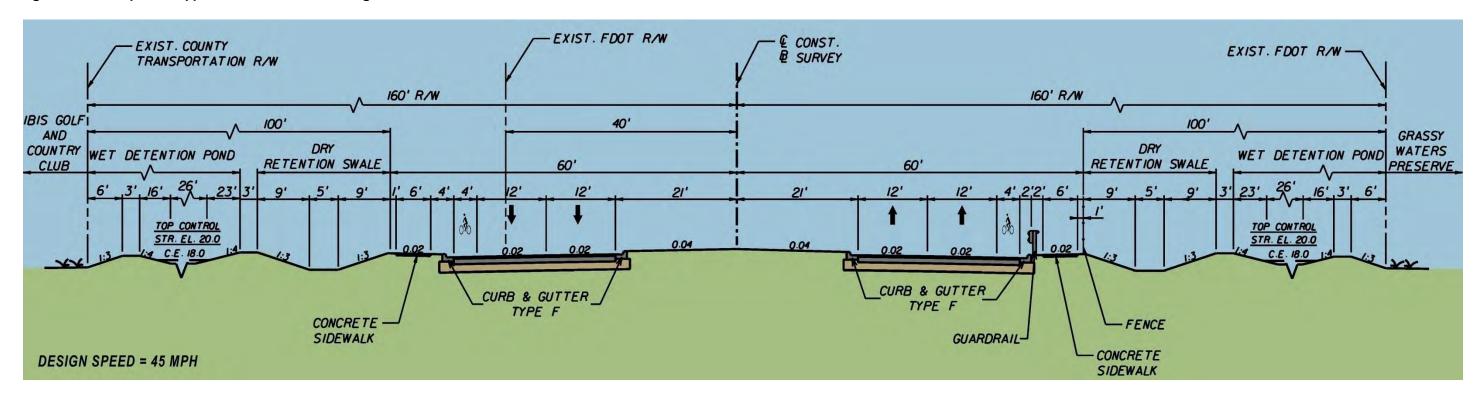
Proposed Typical Section-Center Alignment, Parallel to Ibis
